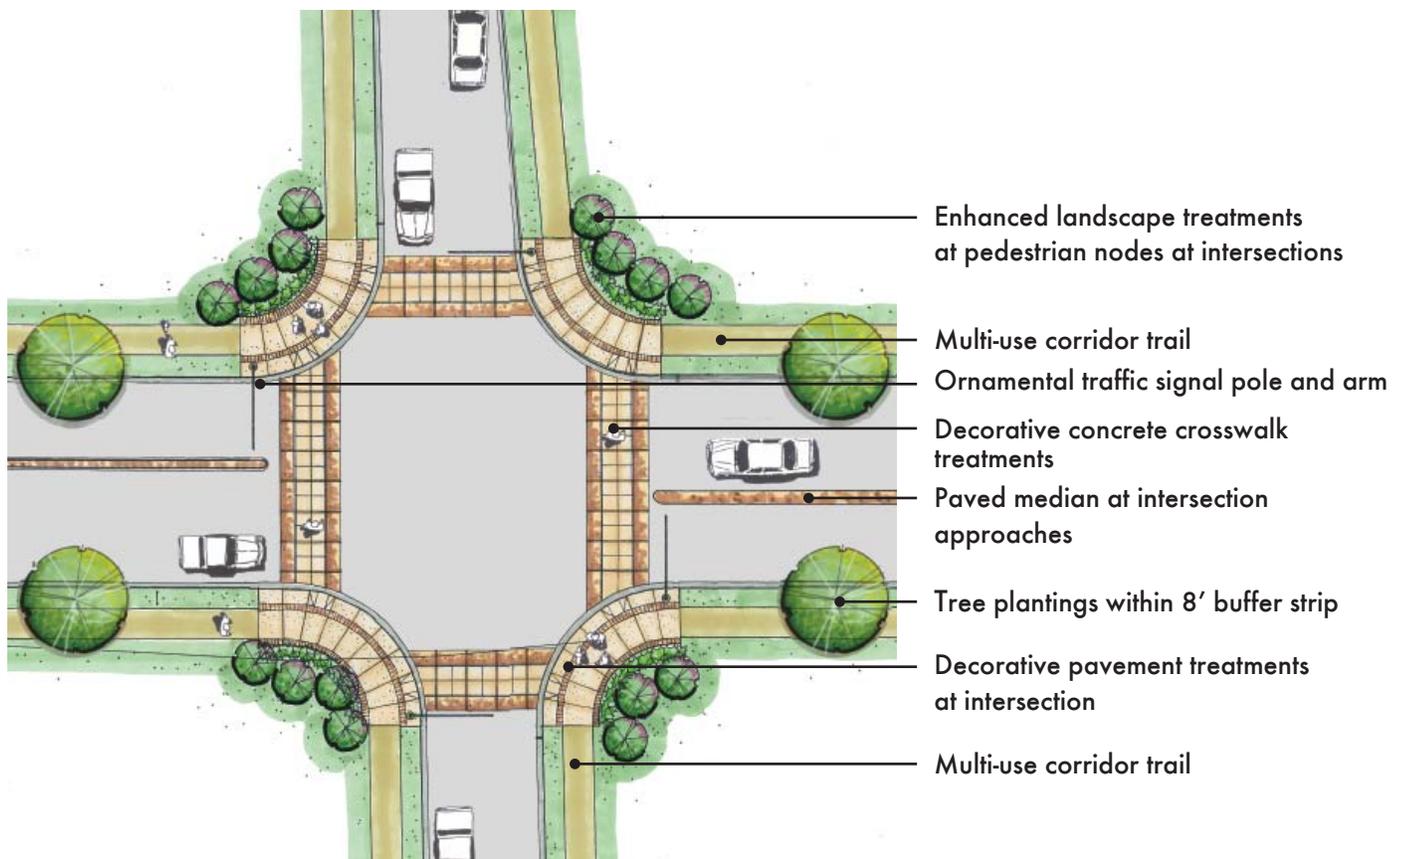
Typical plan illustrating primary intersection treatments with concrete and colored brick pavers crosswalks and additional plantings.
